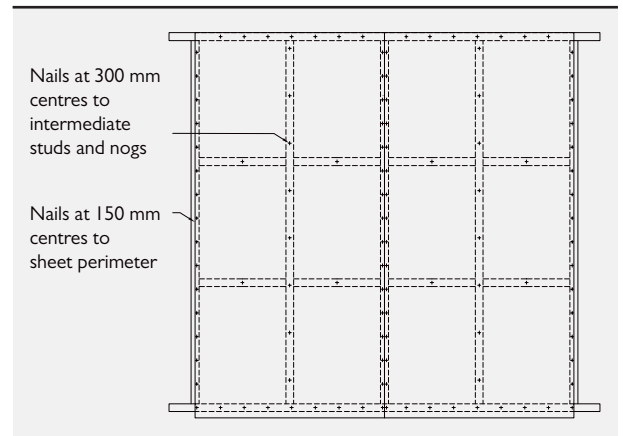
Sheet fastening around sheet edges at 150 mm
